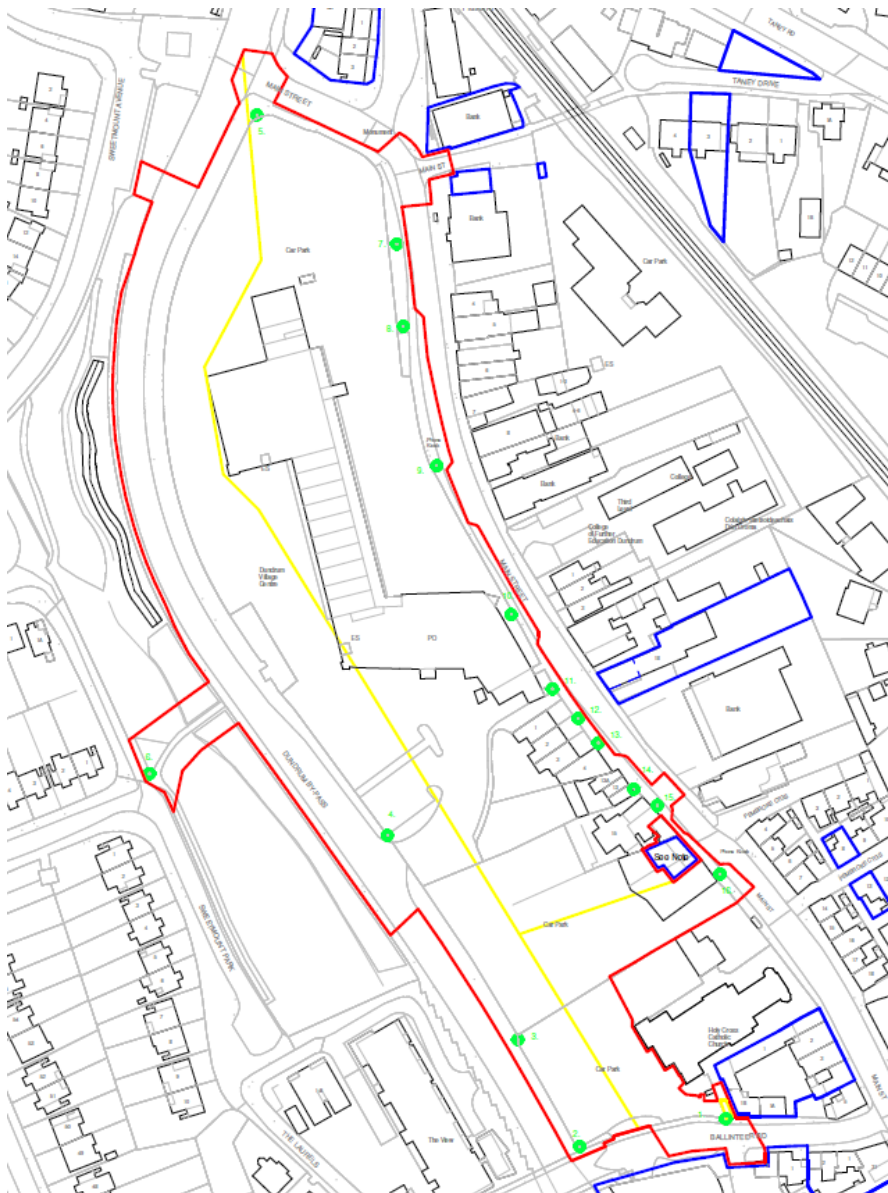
Existing Wayleaves shown yellow (Extract from Site Location Plan Drg. No. DD-GRID-00-ZZ-DR-A-PL001 submitted with this application)
